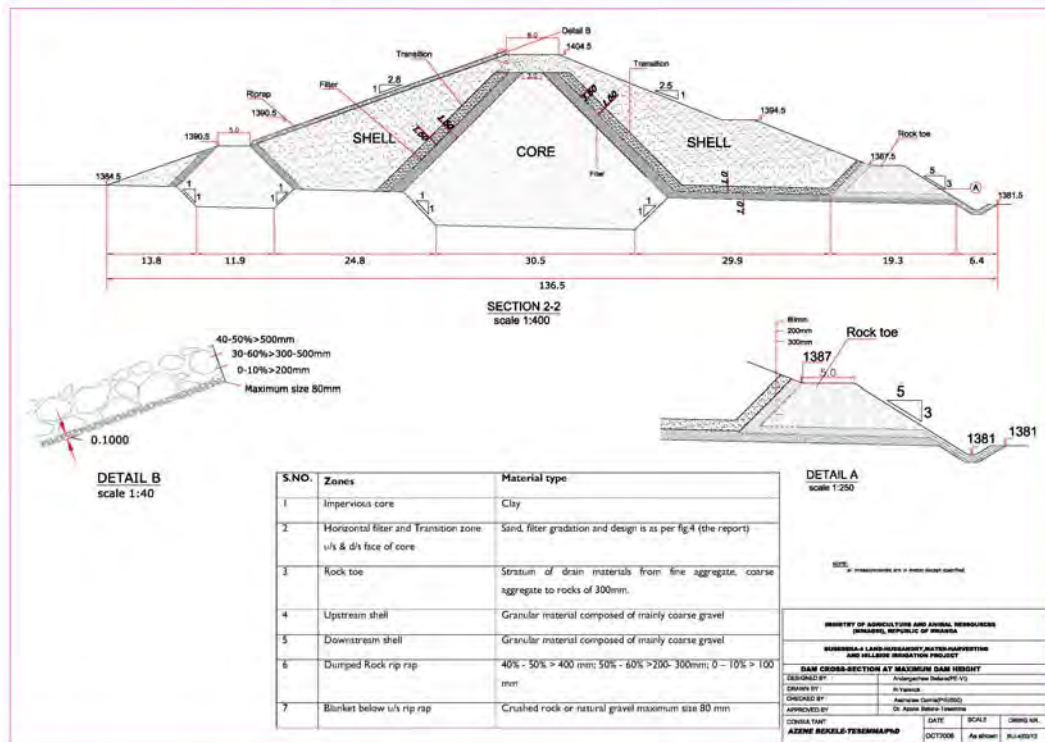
Standard Cross Section of Dam (LWH Design Report)
